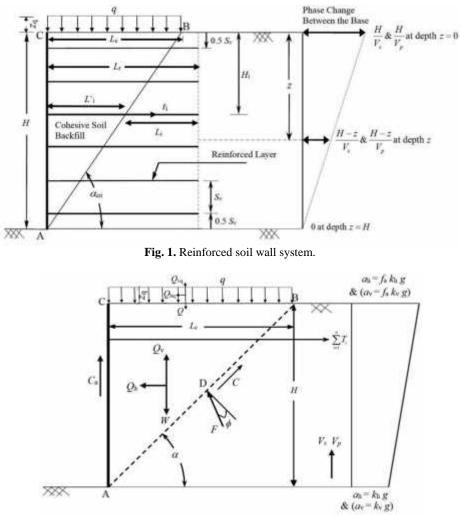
Forces acting on the reinforced soil wall system under seismic condition.
